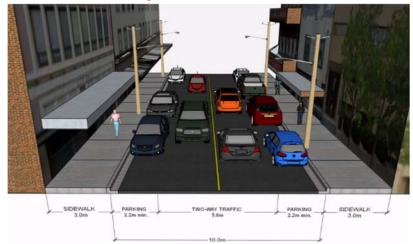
Gottingen Street Typical Cross Section Looking South
